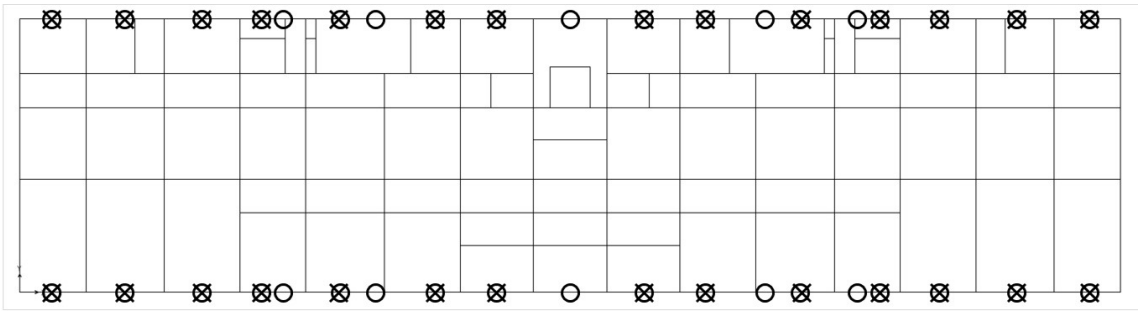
Damper Placement at 2nd floor (R-X); ODAM: 12 dampers
